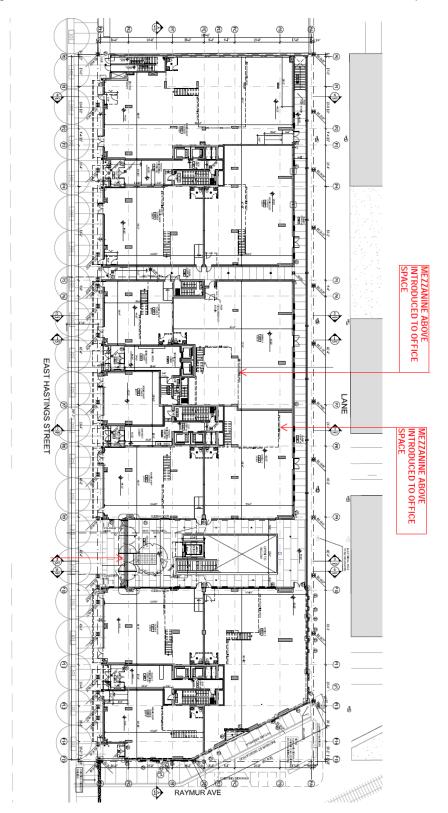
Ground Floor Plan (includes industrial and office floor space)
